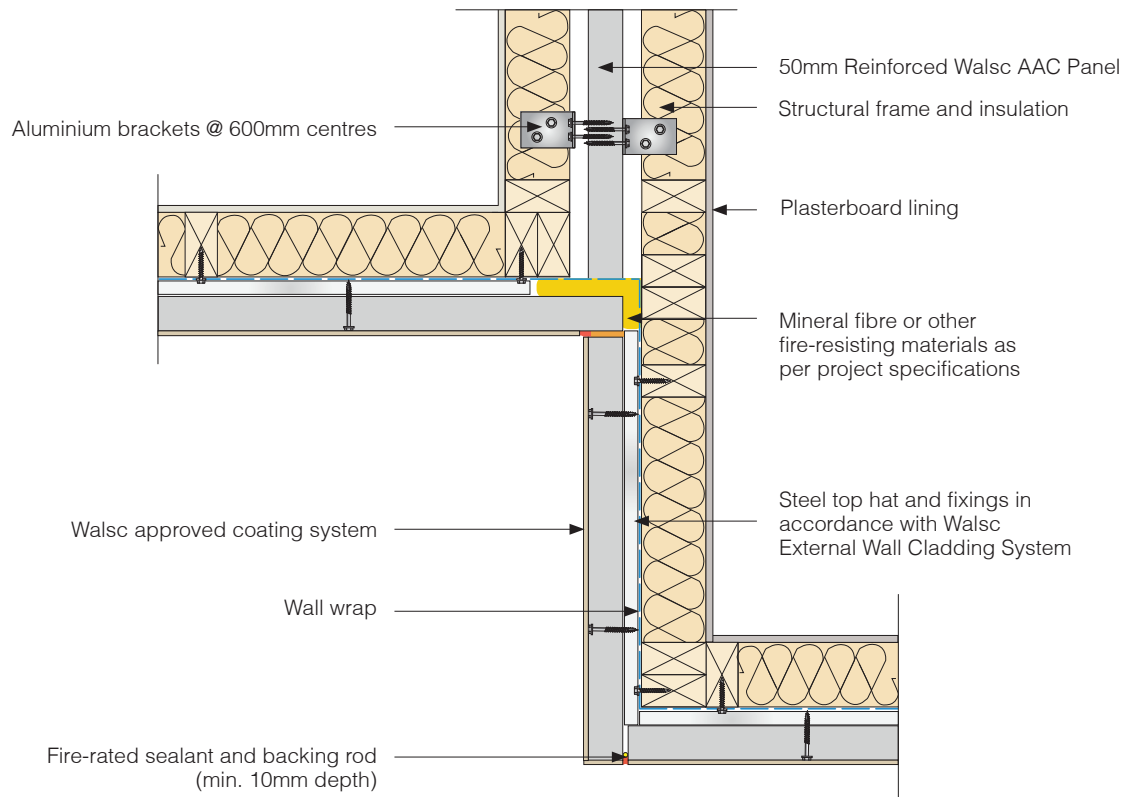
Vertically Aligned System External Wall Junction Detail 2
